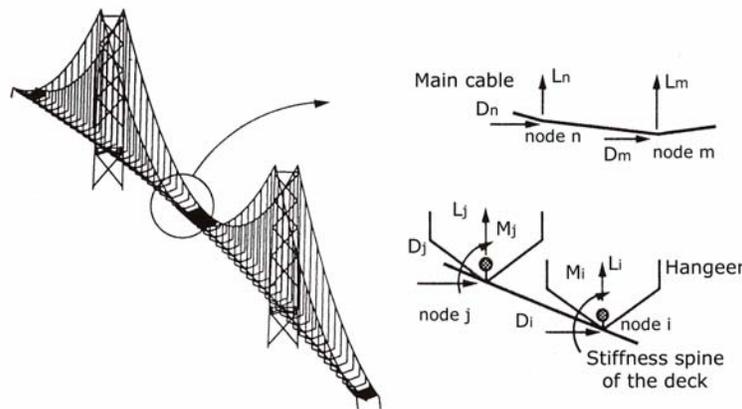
Structural frame model for the Akashi Kaikyo bridge
